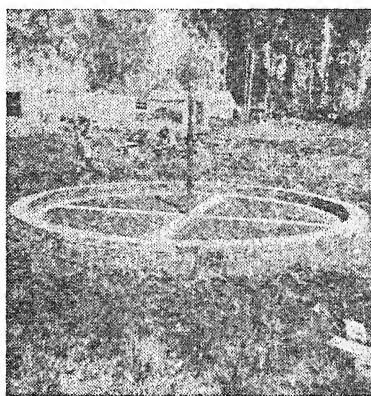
B.—Two brick courses on completed concrete foundation ring. (See also Fig 5.)
